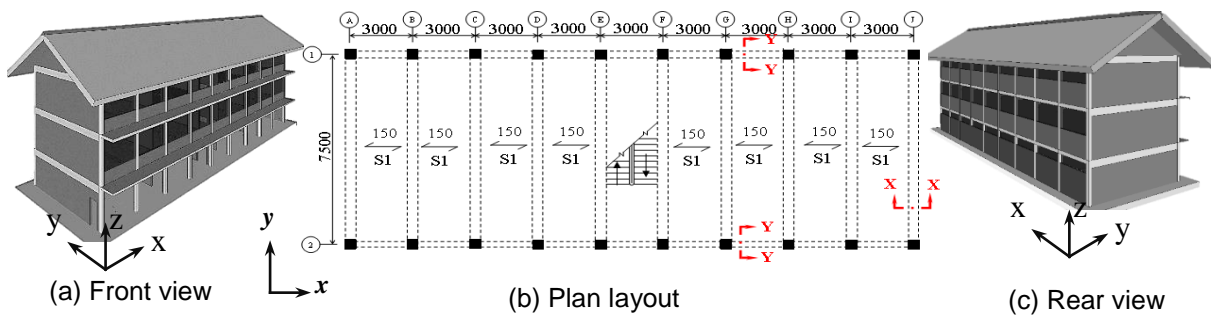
RC frame typologies used in Sri Lankan school buildings (dimensions are in mm).
